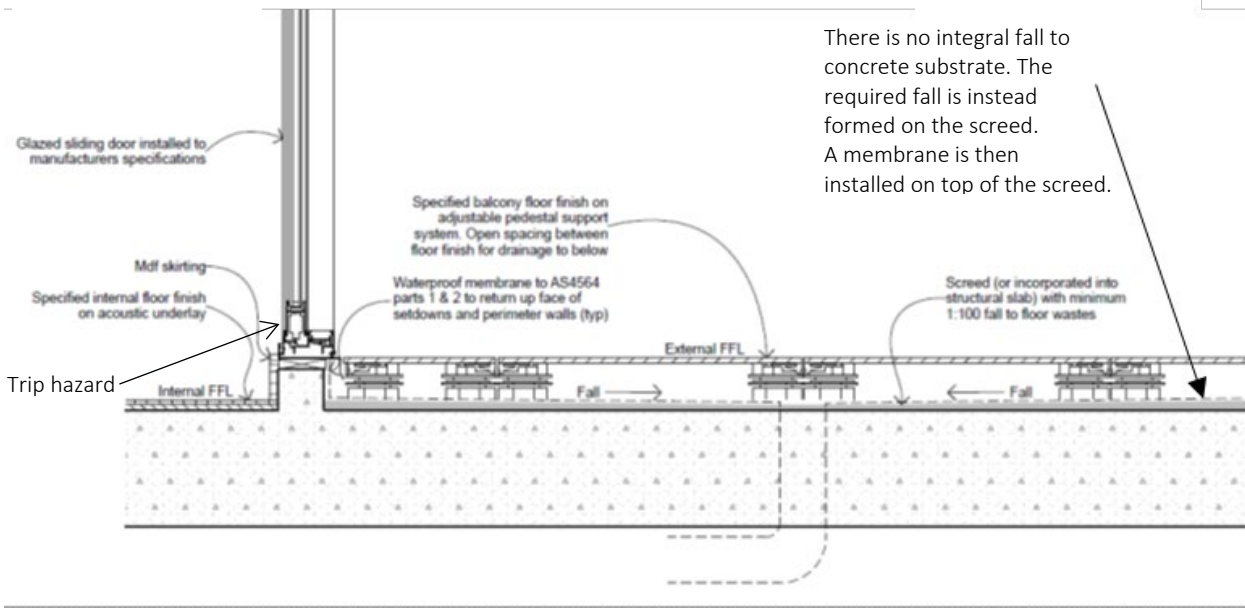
Typical concrete balcony architectural construction details (flat slab, fall on screed and no set down)
